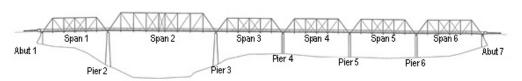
East elevation of the Waldrip Bridge, CR 220 over the Colorado River in Coleman County, TX.
